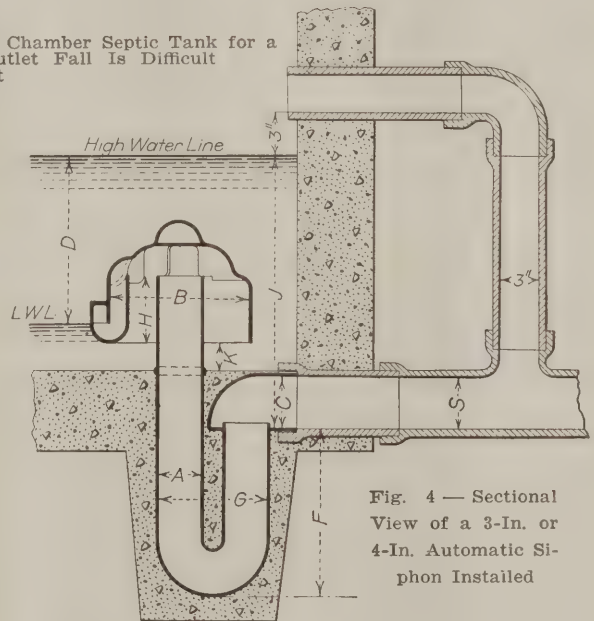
Sectional View of a 3-In. or 4-In. Automatic Siphon Installed
